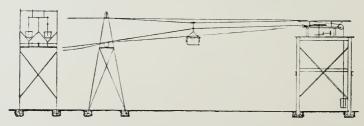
Illustrating Arrangement of Tail Station, &c. (Double Fixed Rope and Endless Hauling Rope System).
